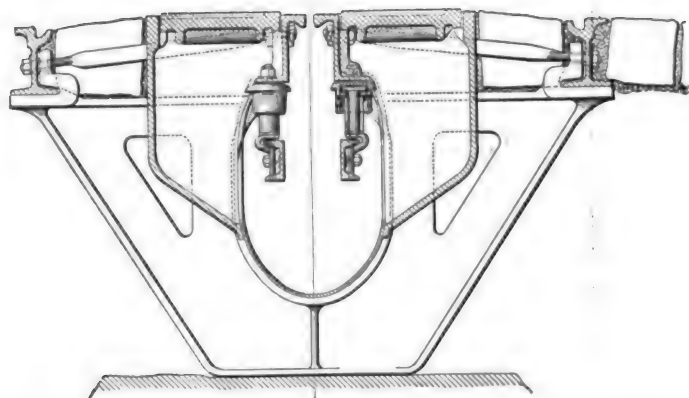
NEW YORK ELECTRICAL UNDERGROUND CONDUIT SYSTEM. SECTION OF CONDUIT—INSULATOR SUSPENSION.
